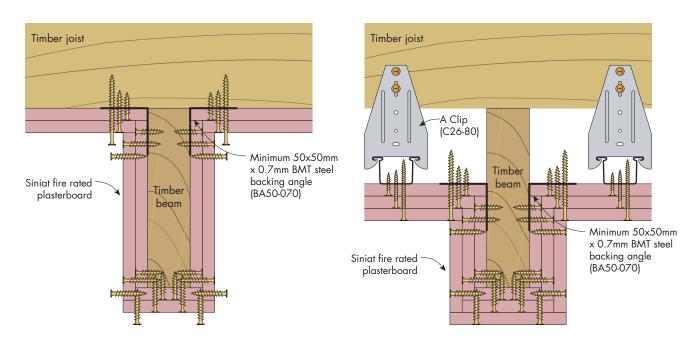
3 Sided Protection for Timber Beam to Ceiling Section
